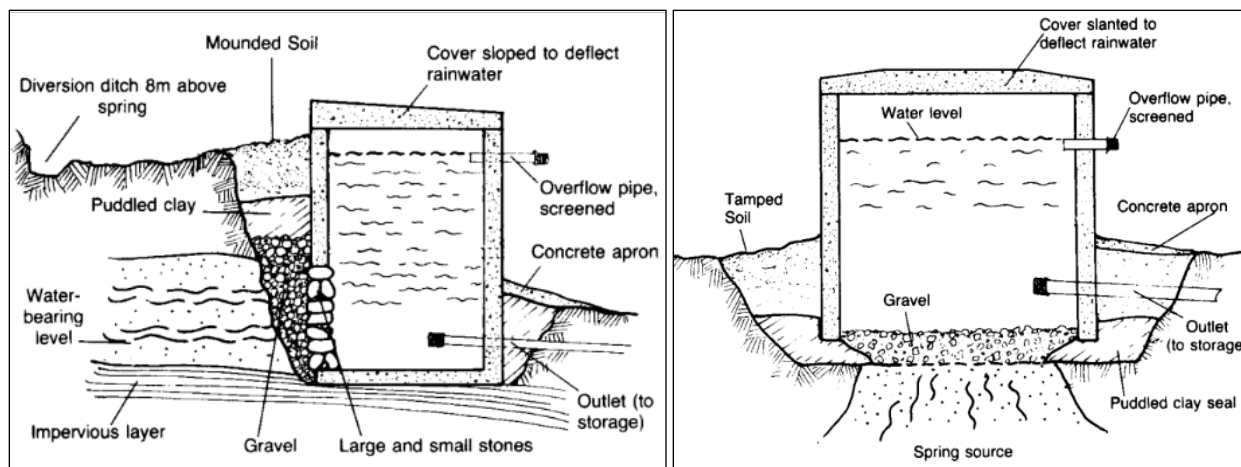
Sectional view of a spring box with side collection (left) and bottom collection (right).³³⁸
